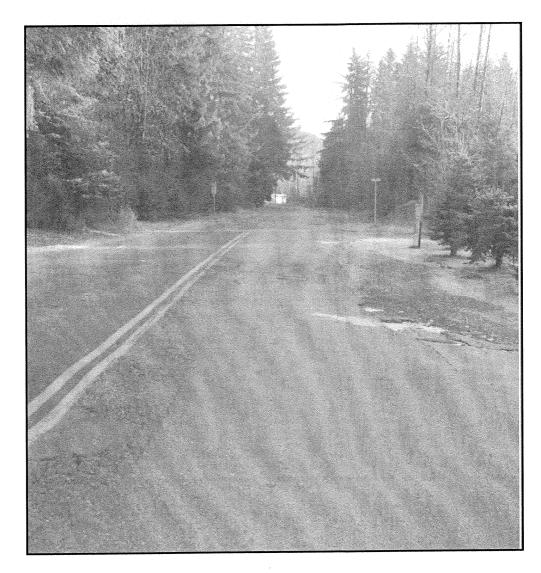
Picture of Berners Avenue looking east. Cracking of road surface can be easily seen. The road shoulder on the right side is failing. Picture taken by staff on 11-3-11.
